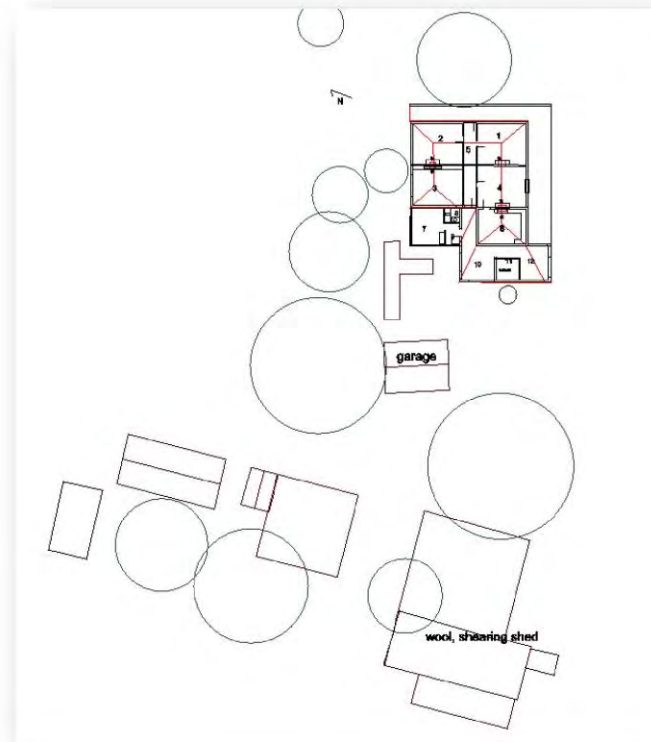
Kerr's farm complex site plan, 2020, NTS, North as shown
